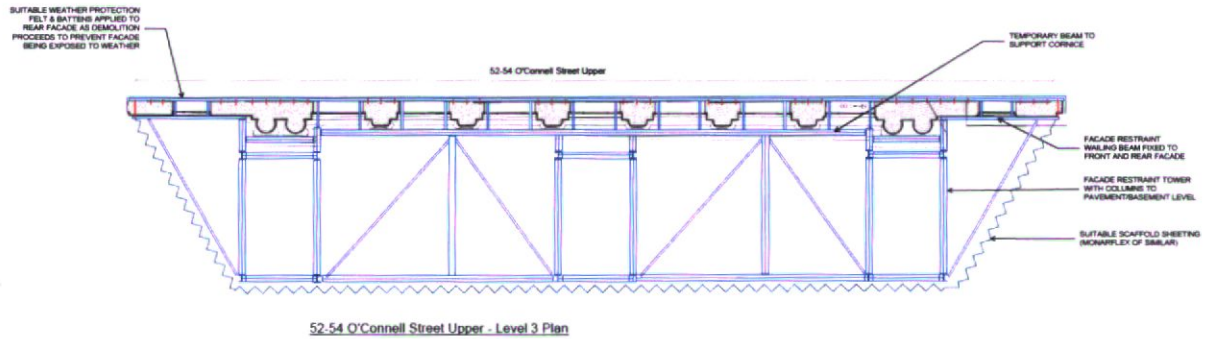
52-54 O’Connell Street Upper (Plan – Typical Façade Restraint System)
